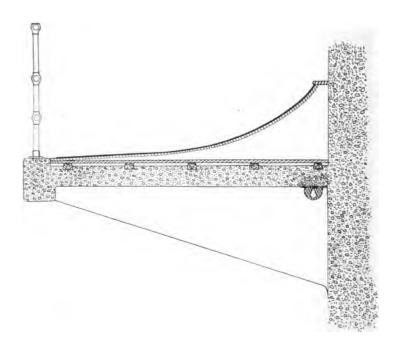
Concrete Gallery Construction with Bracket Support. Note text above for special requirements.
